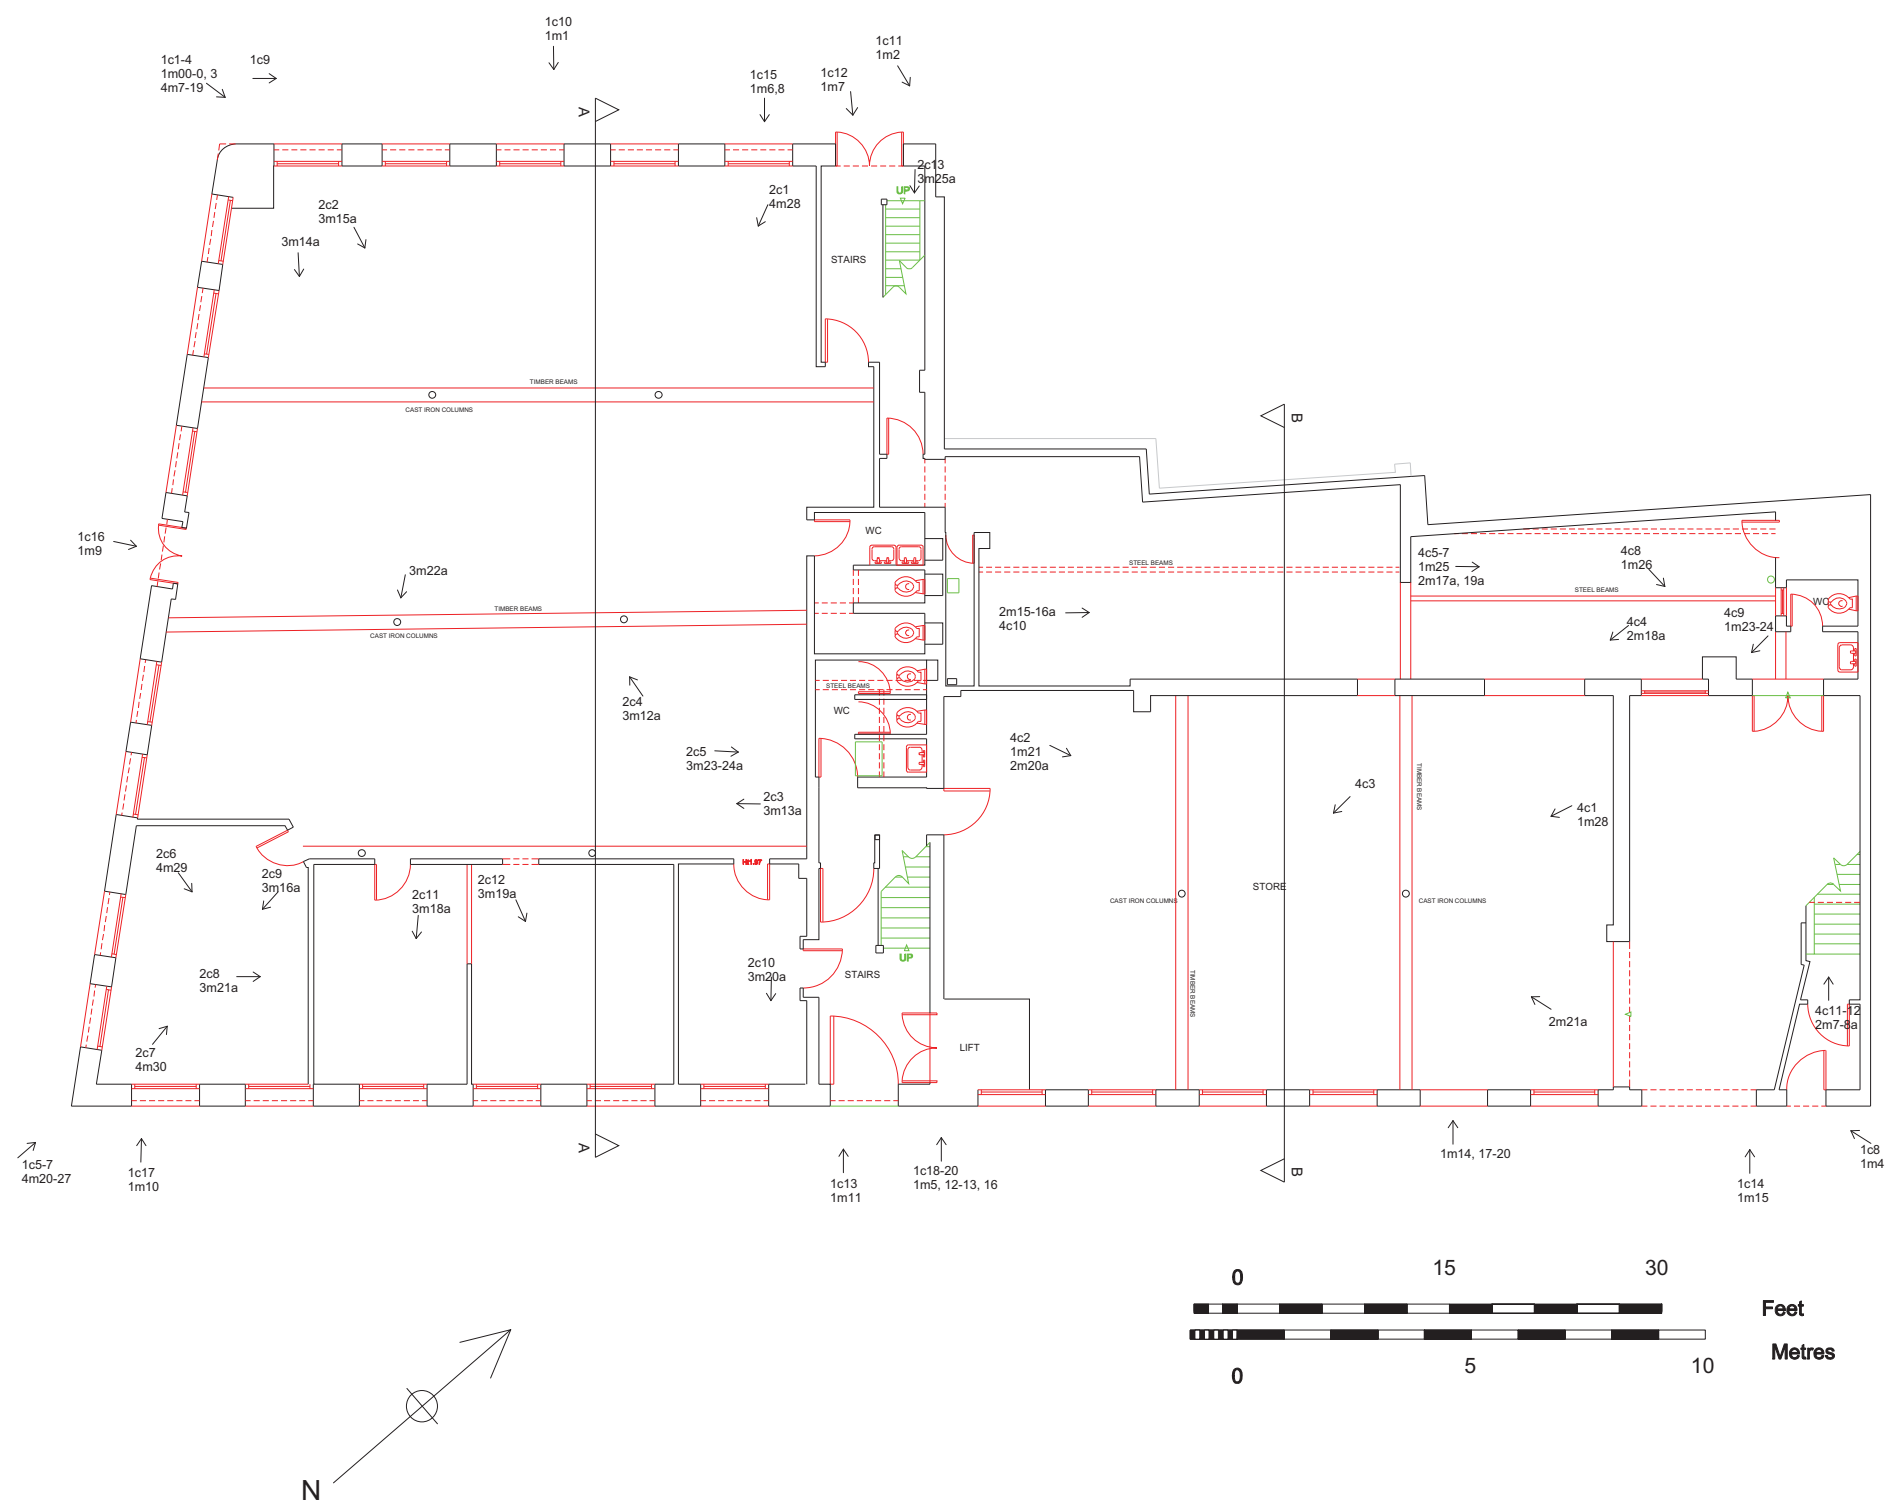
25-27 Bede Street Ground Floor Plan (based upon plans supplied by SV Surveyors Ltd)
